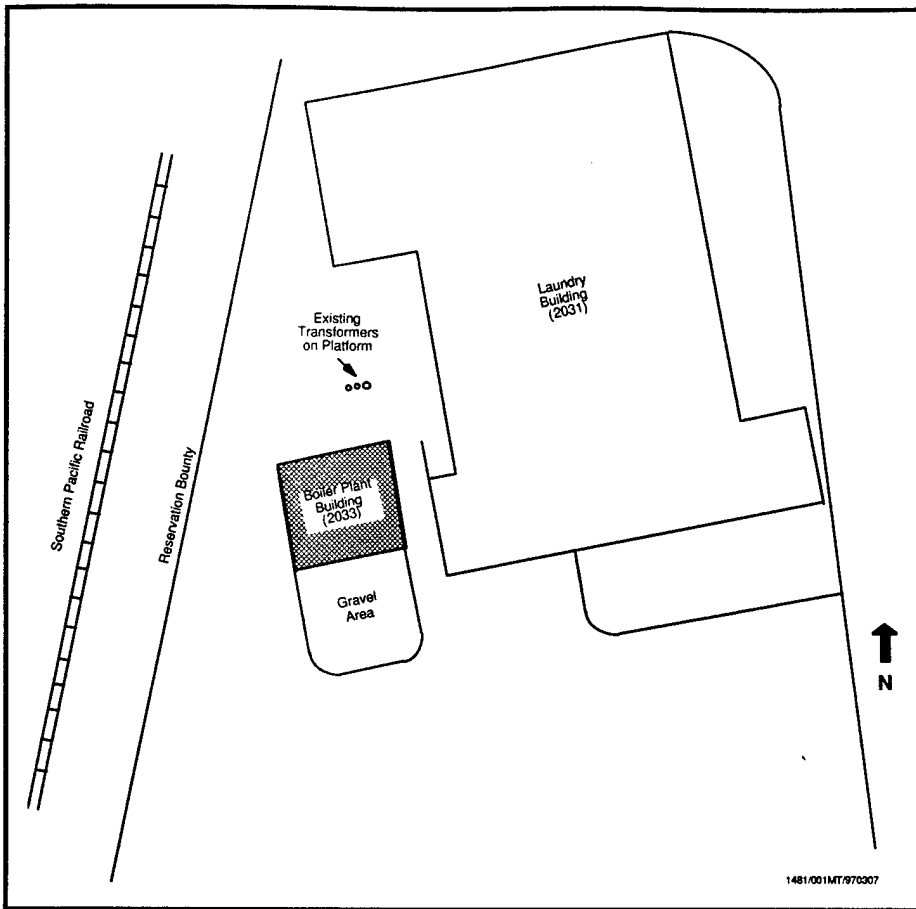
Laundry and boiler plant site layout, Fort Bliss.
